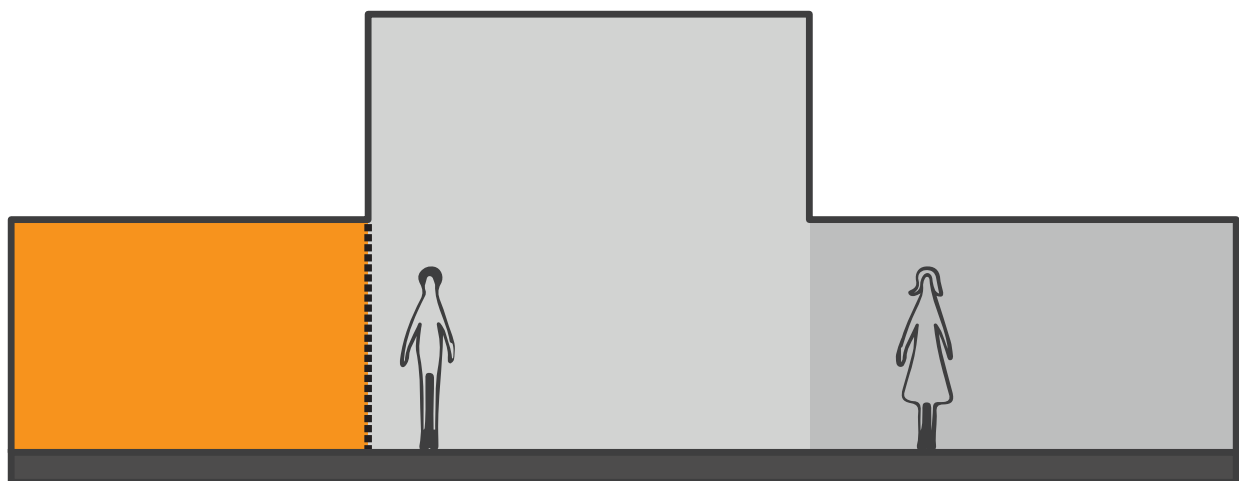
// Flexible space provided through changing roof levels and physical barriers.
